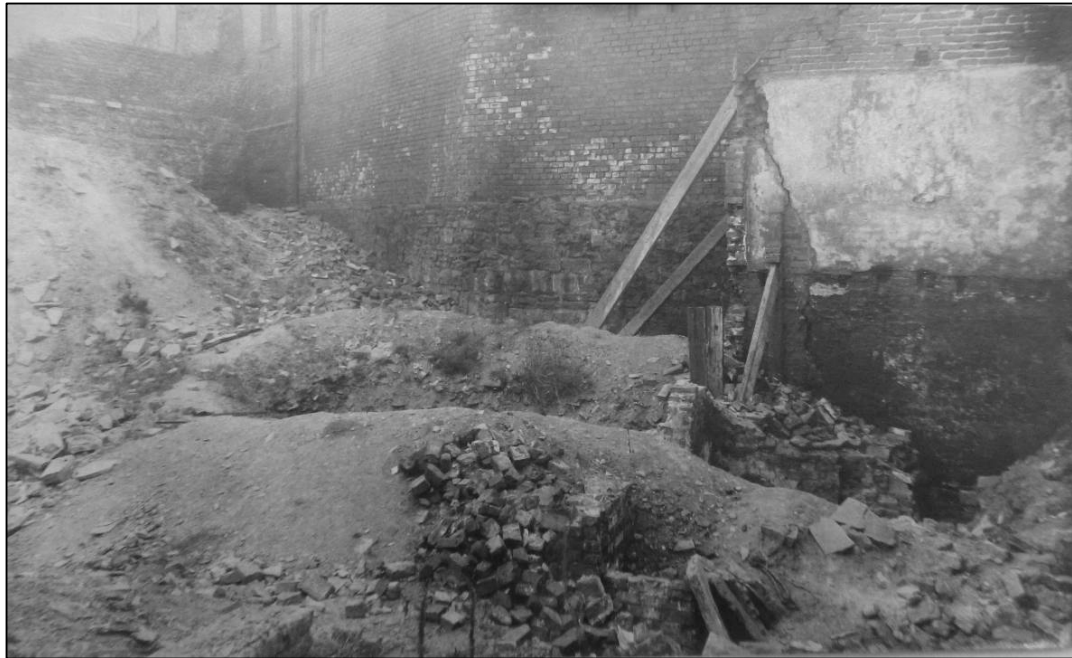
"West wall of passage, but East of Castle site", taken June 1918
